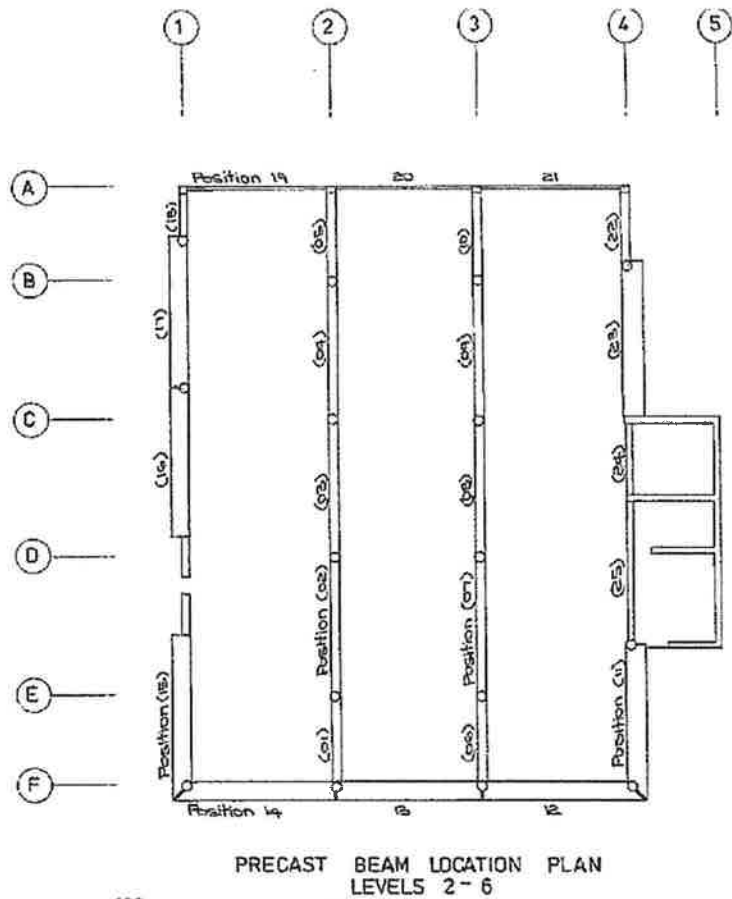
Precast beam layout drawings (Extract DENG Dwg S18
